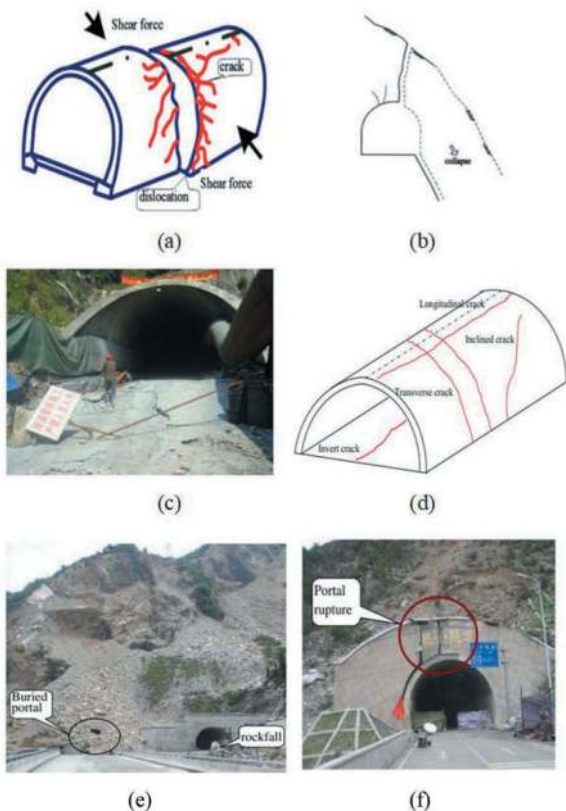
(a) Shear Failure in the Lining (after Shen et al., 2014) (b) Slope Failure Tunnel Collapse (after Wang et al., 2001) (c) Pavement Damage (after Li, 2012) (d) Different patterns of cracks in tunnel lining (after Roy and Sarkar, 2017) (e and f) Types of Portal Damage (after Shen et al., 2014).
